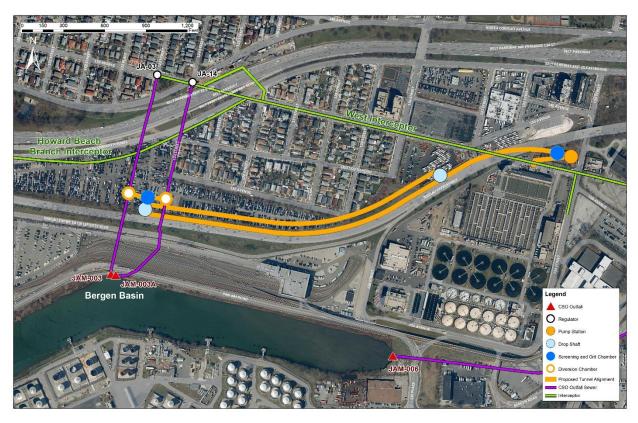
Layout of CSO Storage Tunnel and 50 MGD Dewatering Pumping Station at Jamaica WWTP
